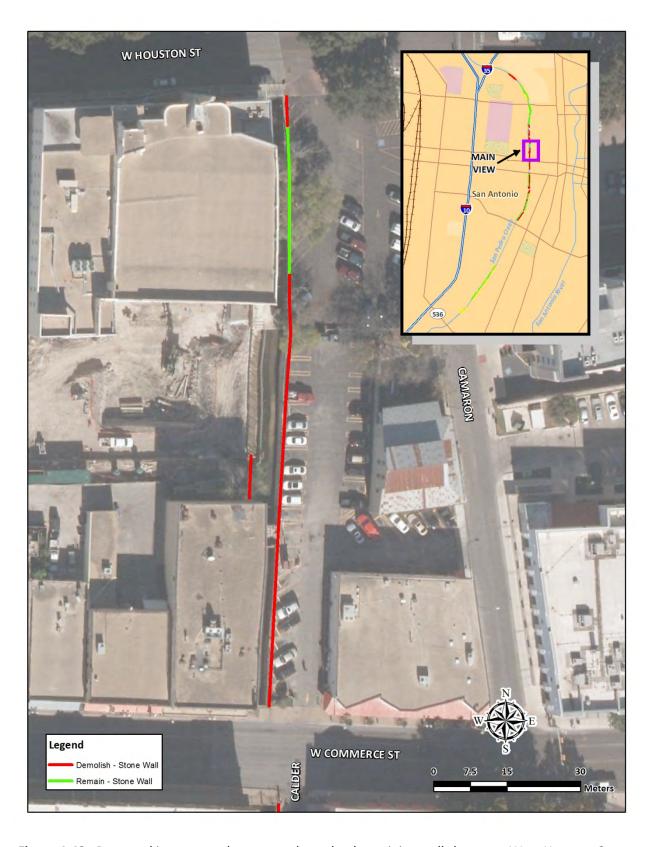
Proposed impacts to the west and east bank retaining walls between West Houston Street and West Commerce Street.
